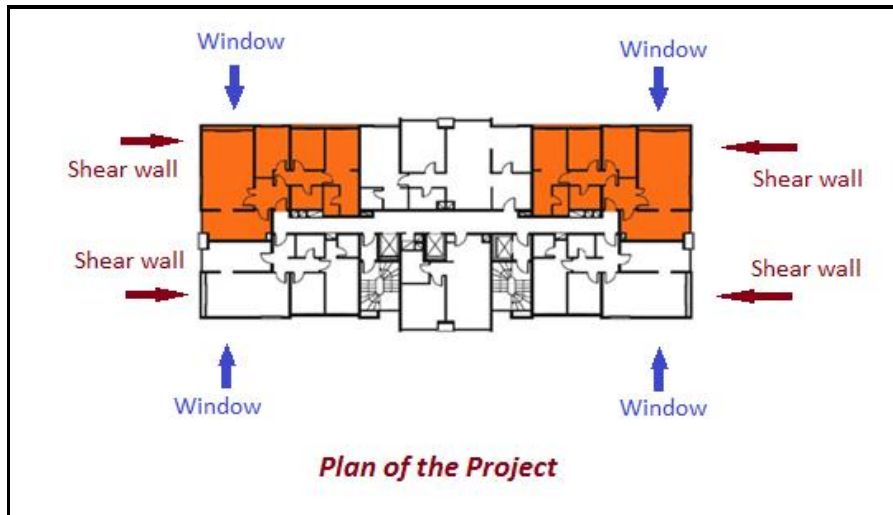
Plan of the Existing building in Istanbul (URL7)
